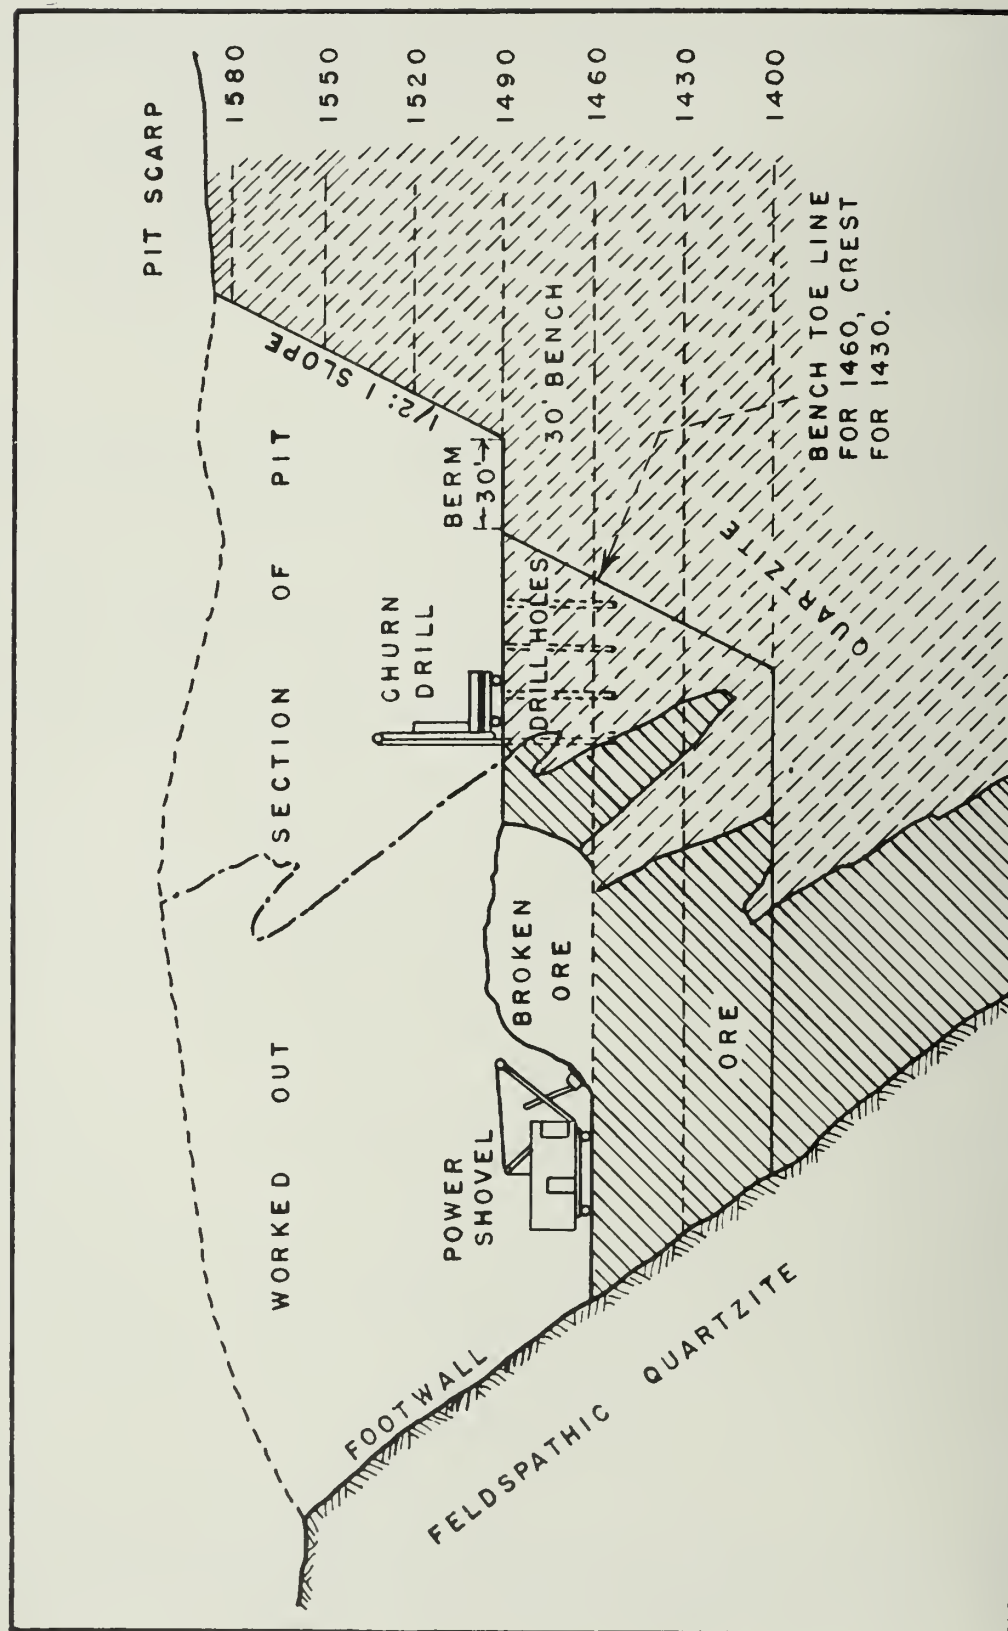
Typical ore section in the North Ore Body, showing bench, berm, and slope arrangement.
